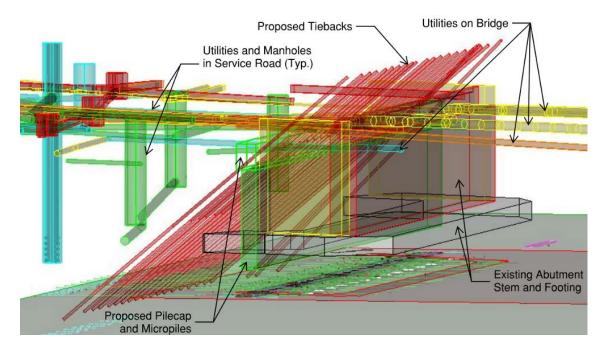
A 3-D model showed the location of utilities crossing and in the service road of each bridge along with the proposed abutment and tiebacks to minimize construction issues and ensure that utility company requirements were met. Pictured is the Rockaway Boulevard Bridge model as an example (Bentley 2020).
